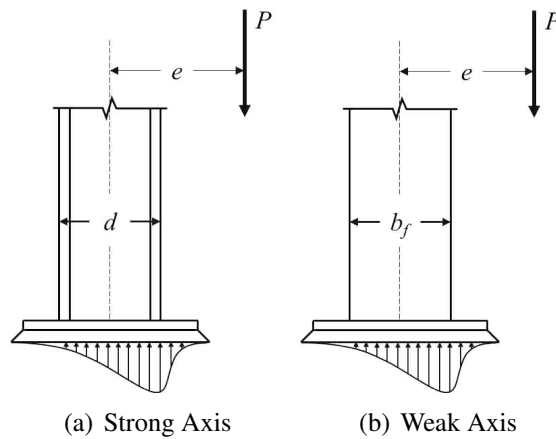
Bearing Mechanism of Eccentrically Loaded Exposed Connections
